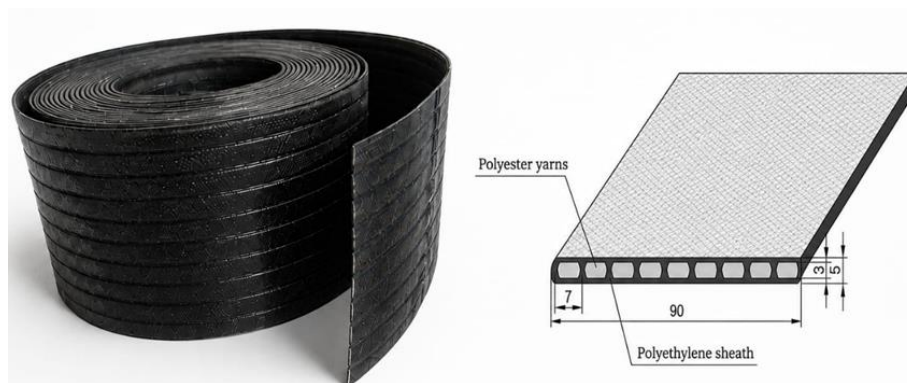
ParaWeb 2D reinforcement strip and cross-sectional schematic (nominal strip width = 90 mm)
